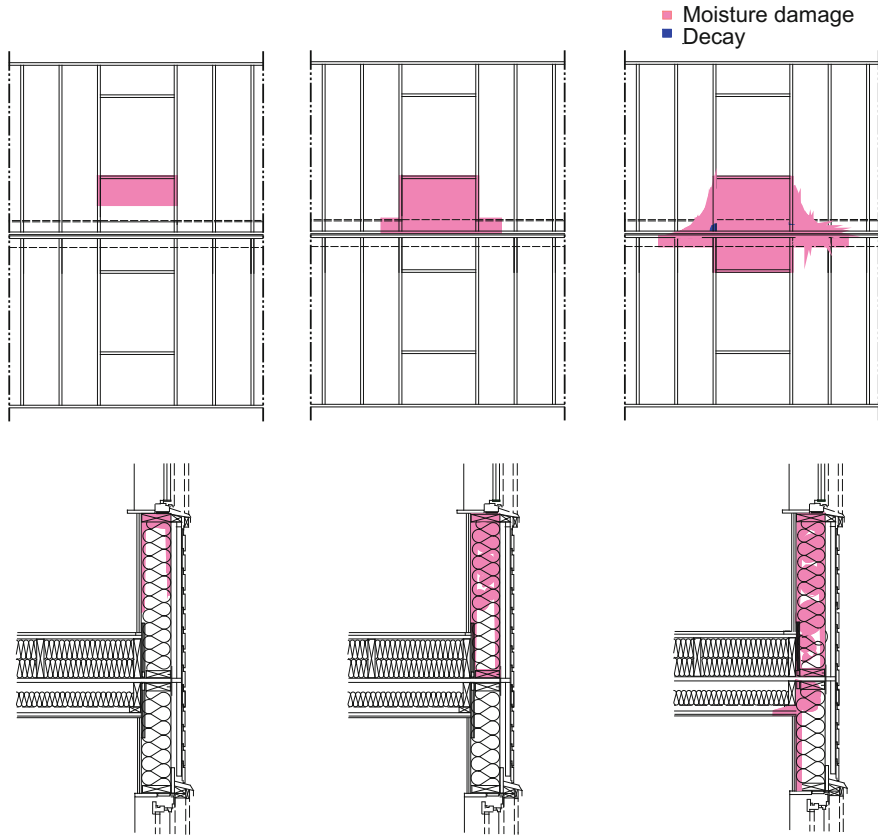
Scenarios for three different extent of moisture damage in window connection in wall with timber frame structure. Upper: Front view of water spread in wall. Lower: Section of water spread in wall
